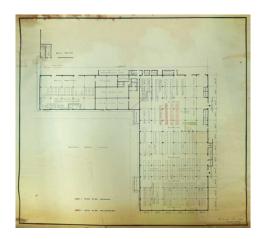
Drawing for the layout of the ground floor of the New Spinning Mill, 1972. (Source: Pacific Brands plan room)
